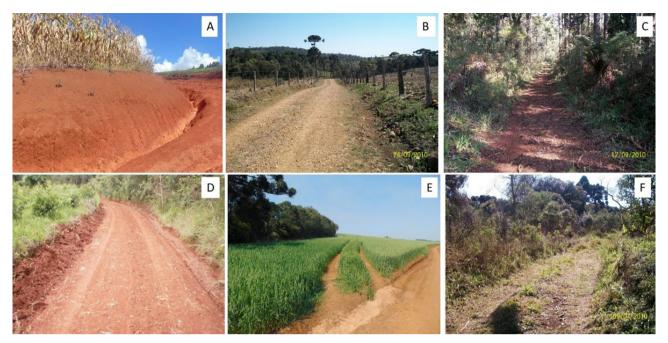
Types of roads. A. Unpaved rural road; B. Rural roads with gravel; C. Forest road; D. Road bank; E. Rails; F. Abandoned roads.
